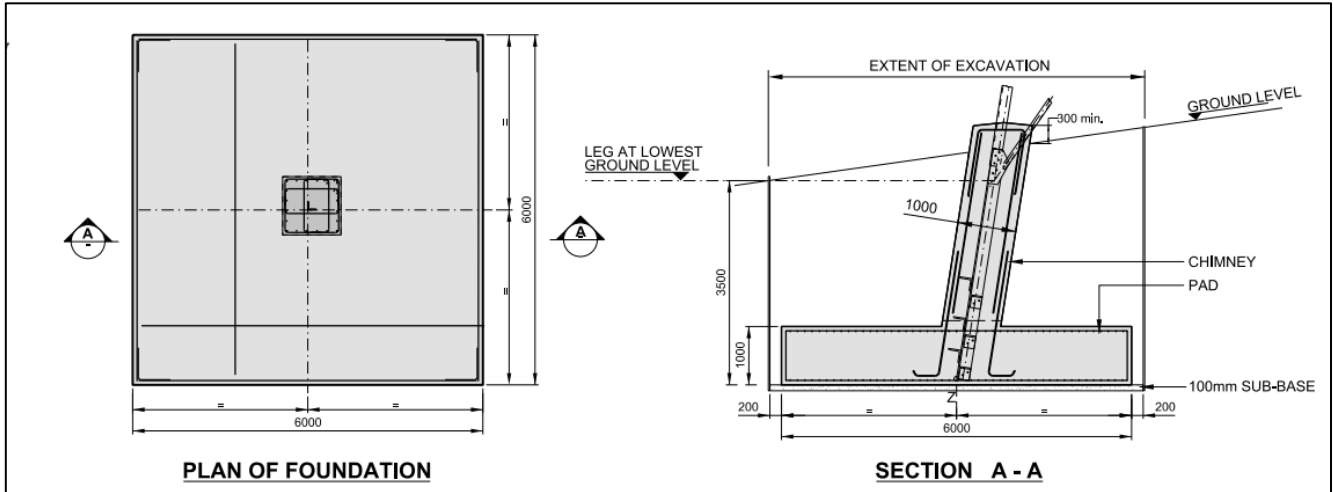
Typical Angle Tower Leg: Pad & Chimney (dimensions subject to site specific design)
